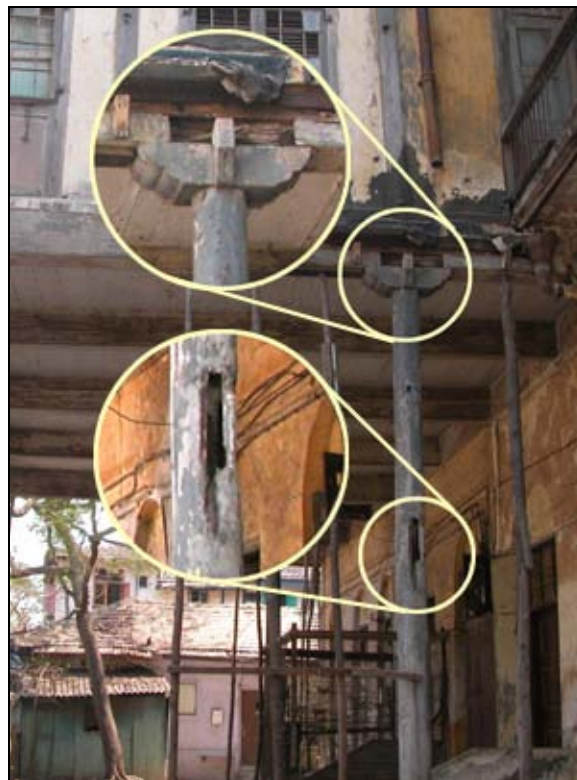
Reduced cross-section area and deteriorated beam-column junction of timber column
